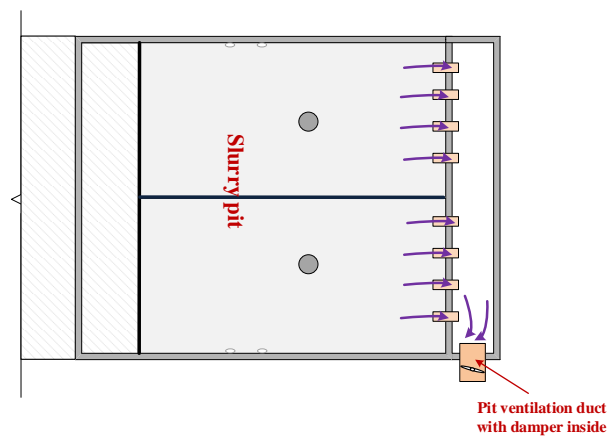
Pit ventilation system underneath the floor in one room (both rooms have the same layout).
